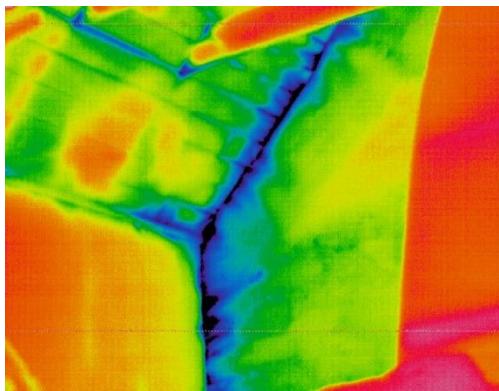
Thermogram of where the uninsulated north gable joins with insulated west wall and ceiling, indicating significant air leakage at joist ends, cool spots behind timber ceiling and air ingress at the corner.
